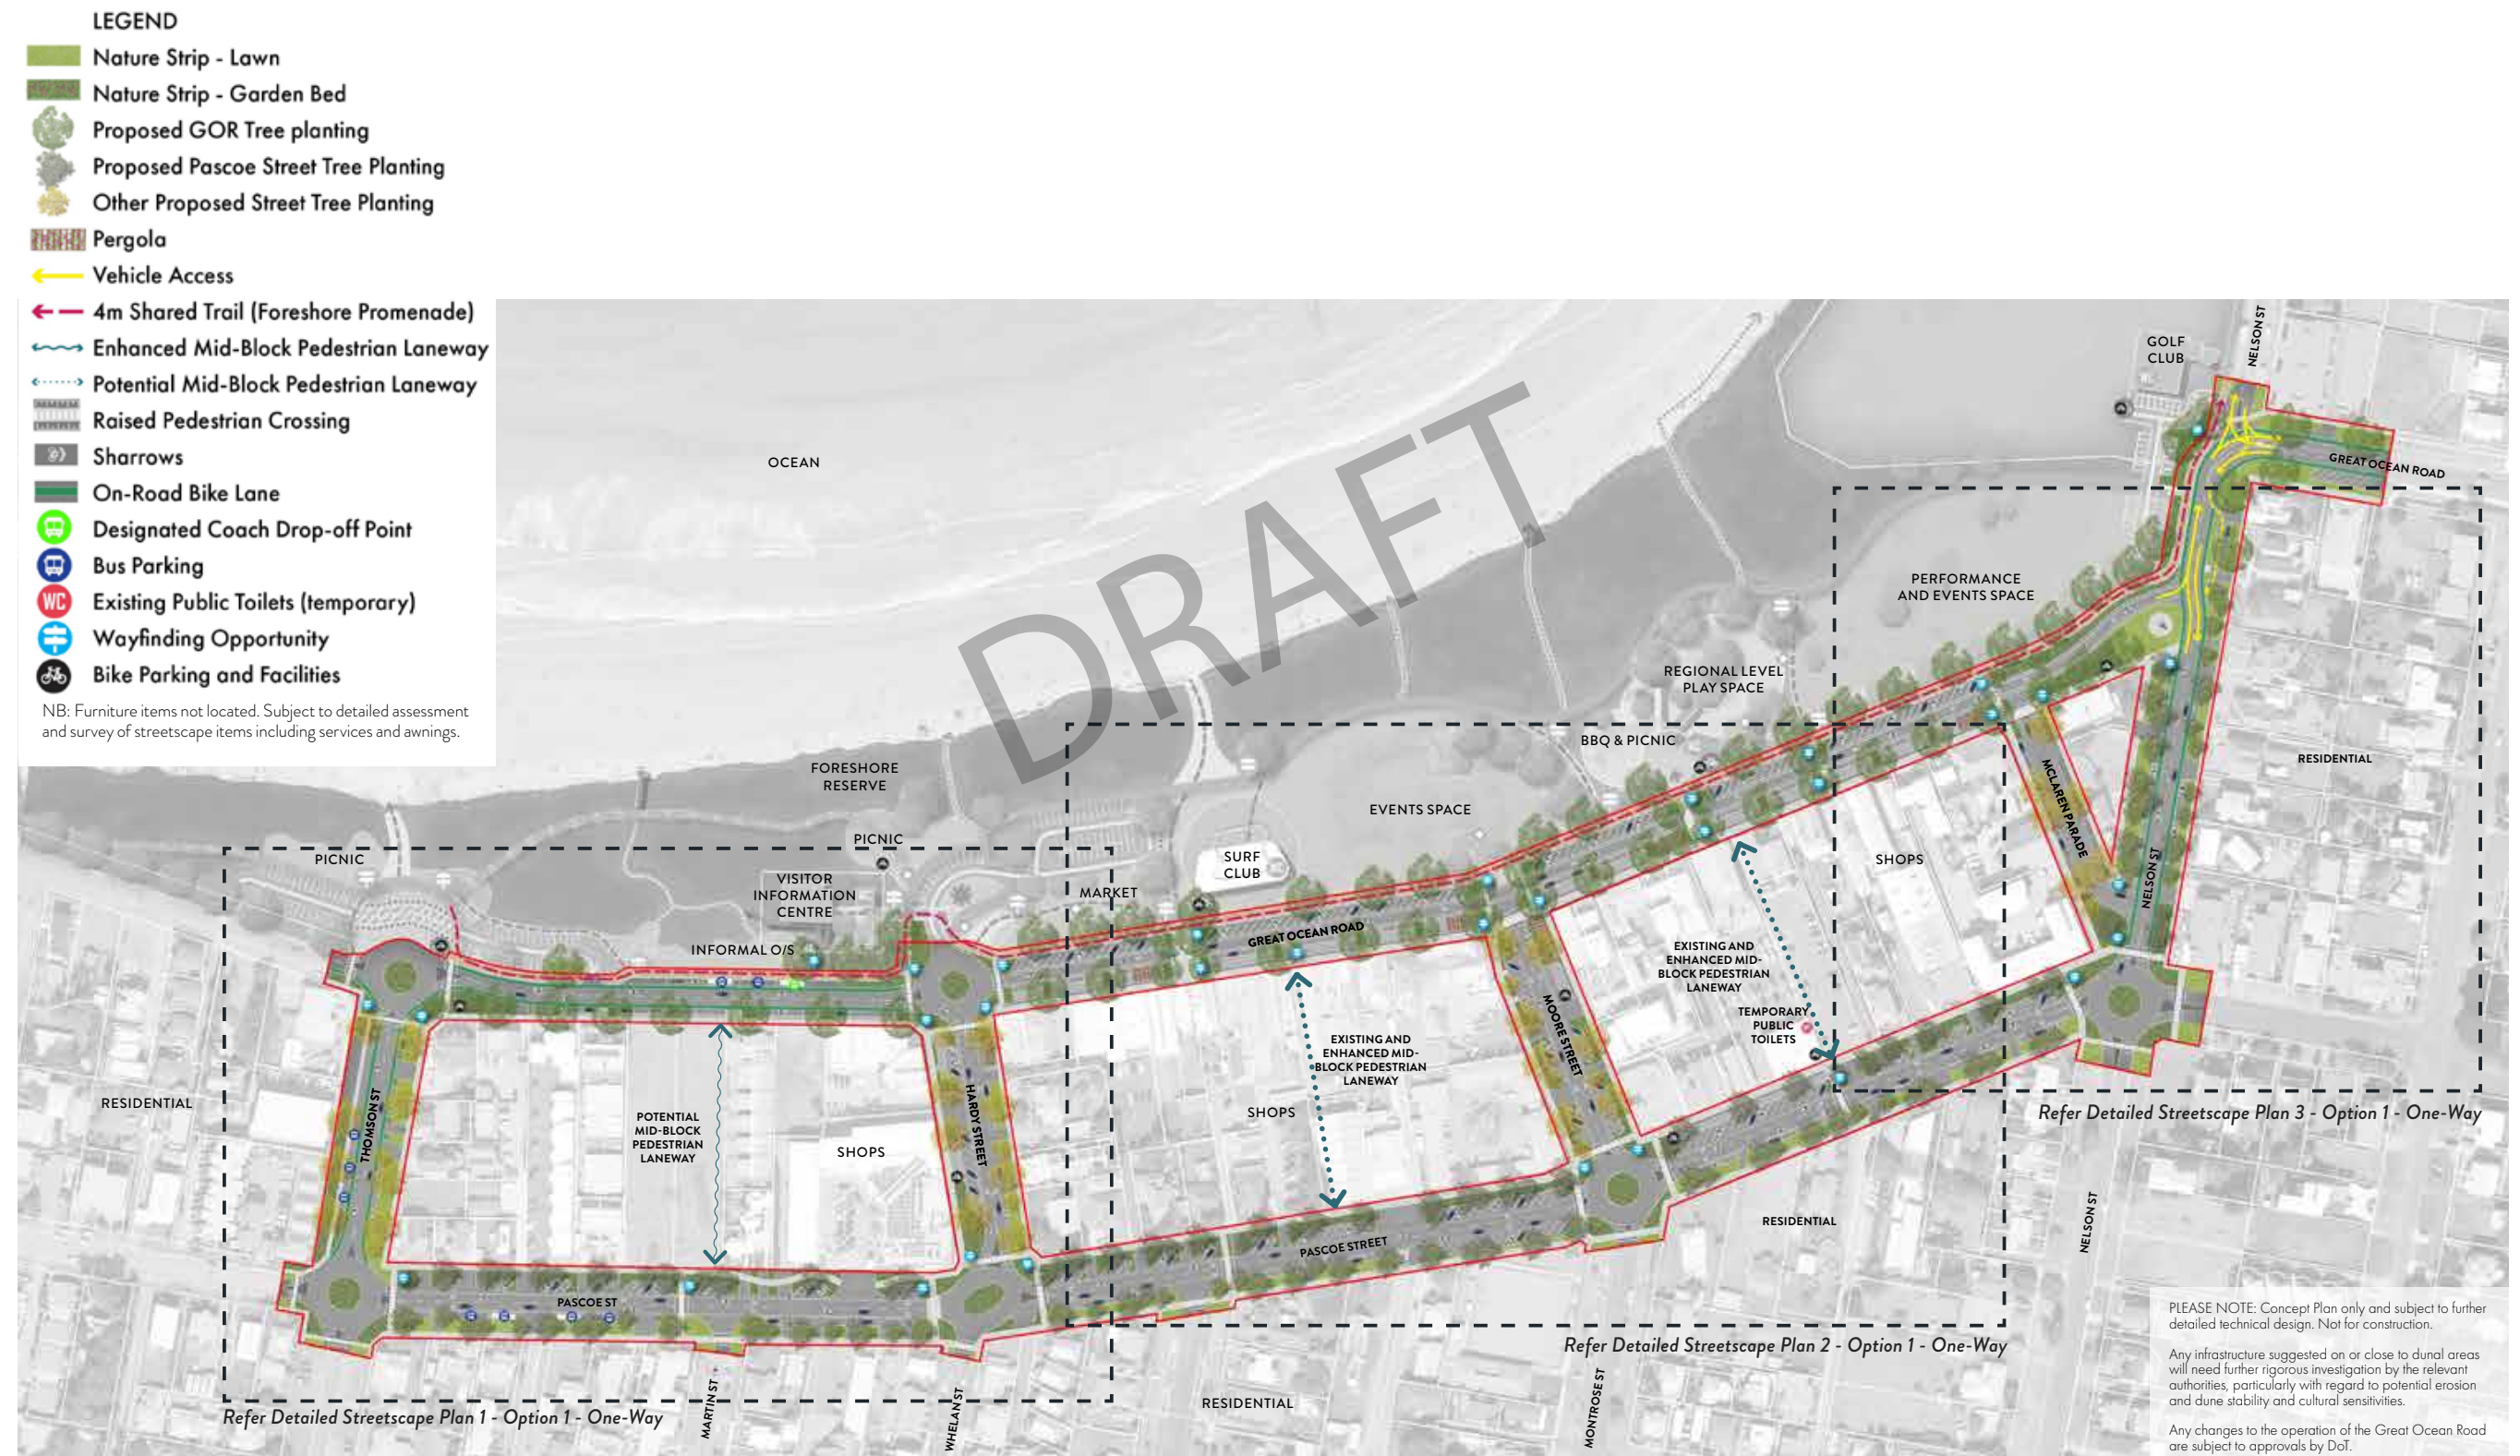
Overall Streetscape Plan - Option 1 - One-Way
